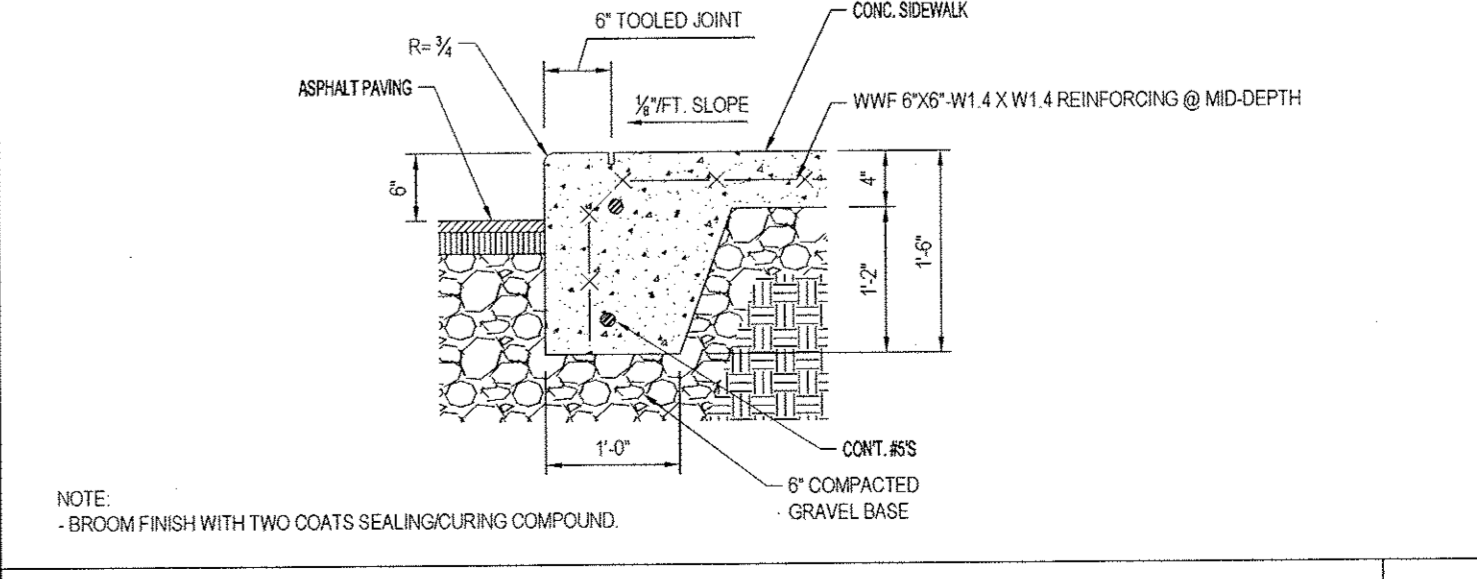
DETAIL @ SIDEWALK EXPANSION JOINT N.T.S.
